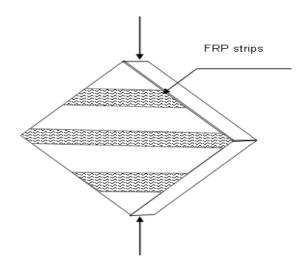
Strengthening and testing scheme proposed for masonry wallets.
